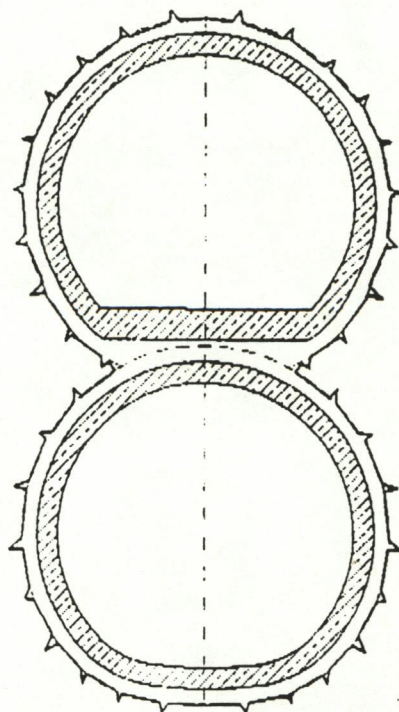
tunnels one above the other without structural connection (inner lining not shown)
